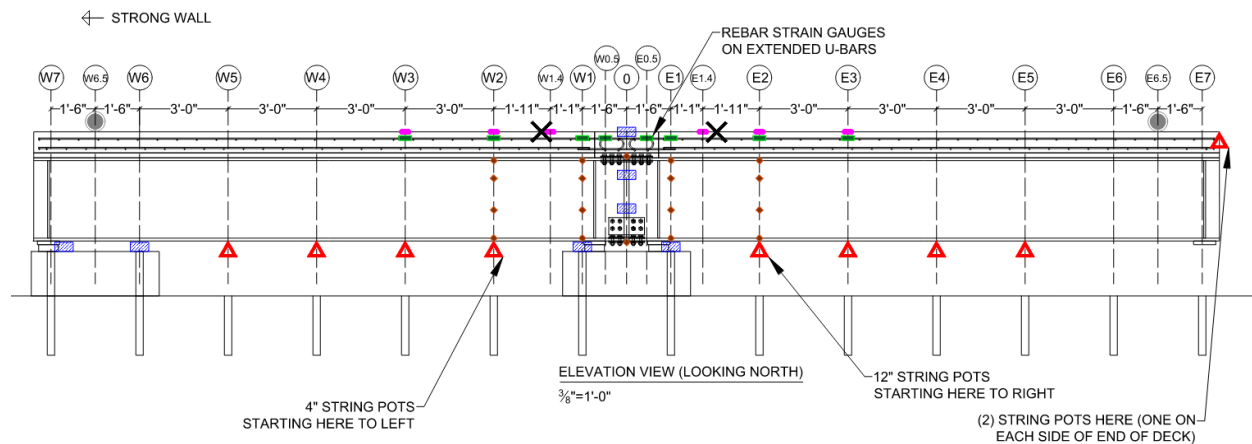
Concept A Instrumentation Plan (Elevation View).
